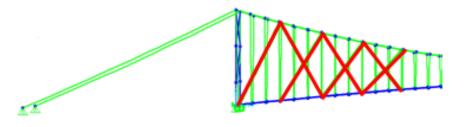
Vertical Bracing Pattern at Ends of 60 m Span Footbridge
